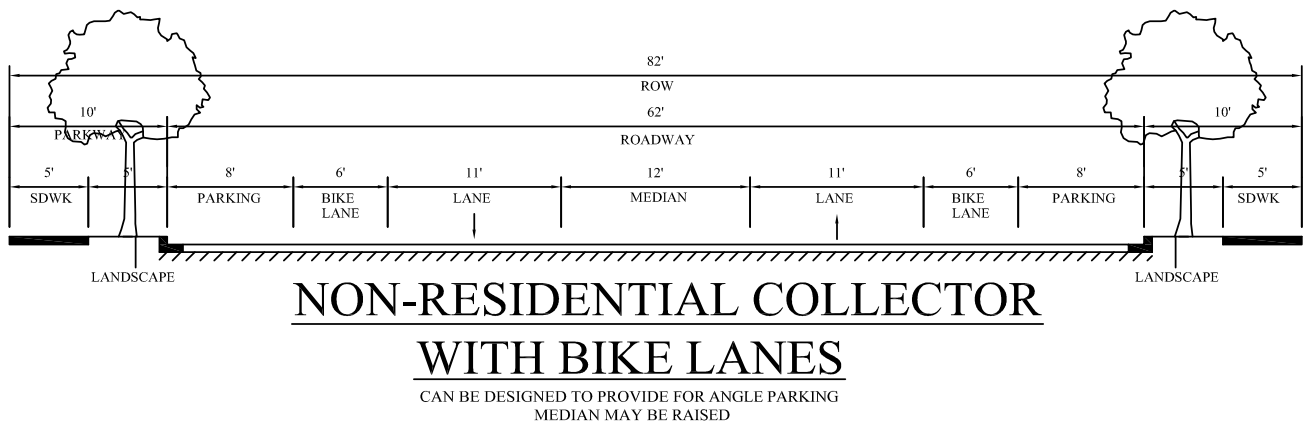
Recommended cross section for collector roadway reproduced from the Design Standards for Construction
